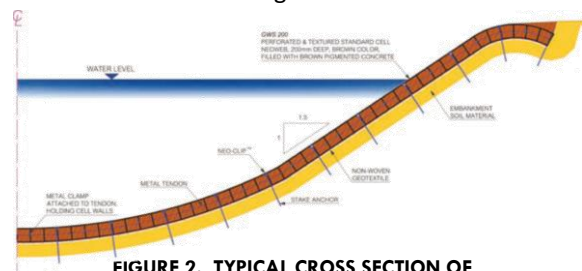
TYPICAL CROSS SECTION OF CHANNEL SLOPE PROTECTION
